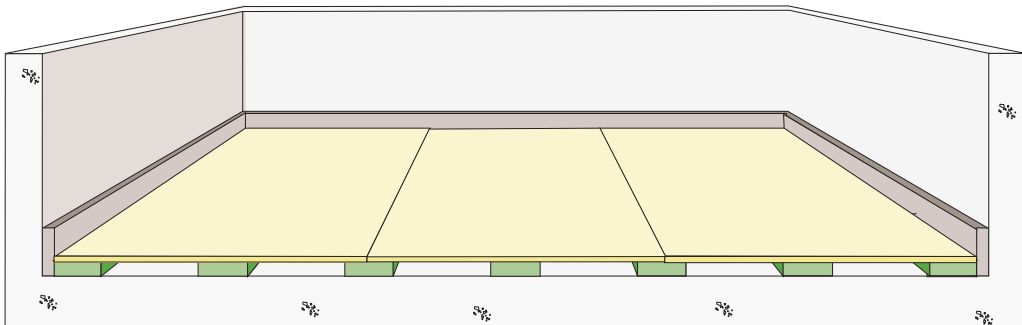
Place ply sheets onto Isolators and secure in place.
